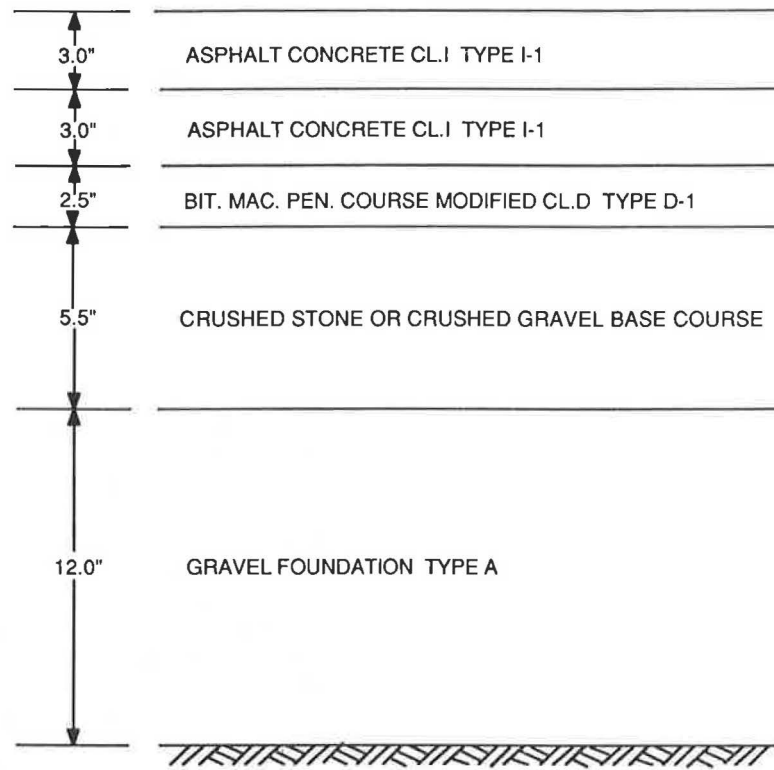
Cross-section of pavement structure for the Rhode Island site.
